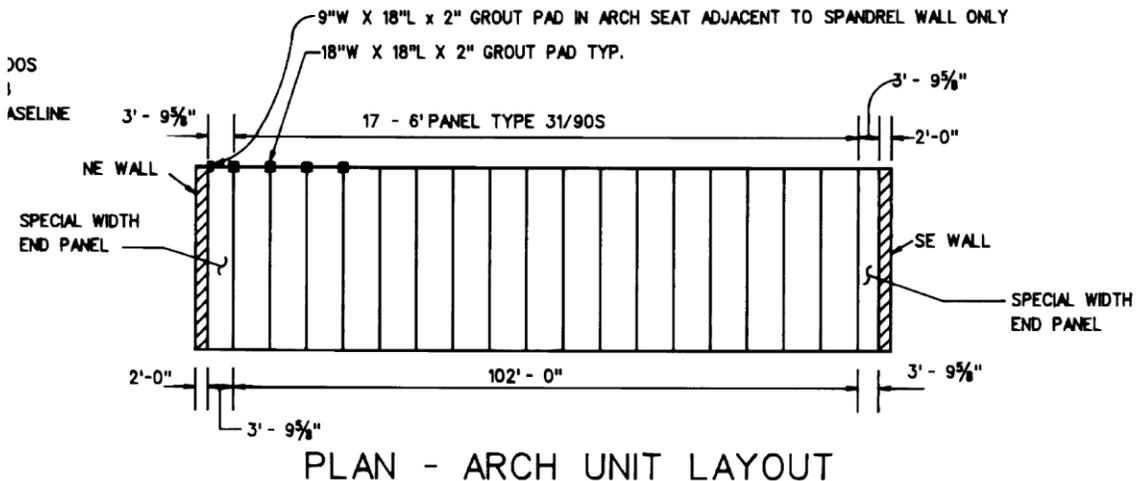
Cut-Out Plan View of Arch IV Construction Plan (cp. Appendix K)
